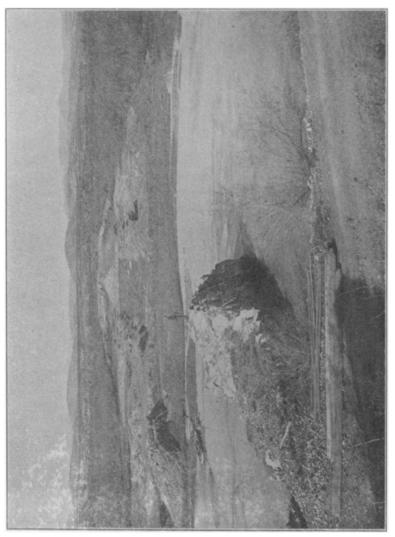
PLATE VII.—Site of Leasburg Diversion Dam on Rio Grande. Under construction. Canal gates will be set in Penasco Rock in foreground. Concrete dam will extend from Penasco Rock to join embankment in distance.
